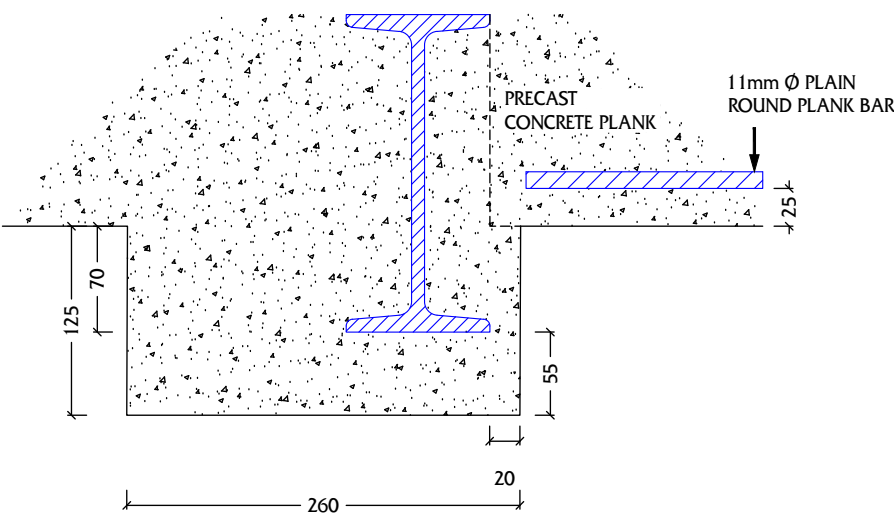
PART SECTION LOOKING WEST THROUGH 1ST FLOOR PRIMARY BEAM - SURVEY AREA Q/11-12 SCALE 1:5
